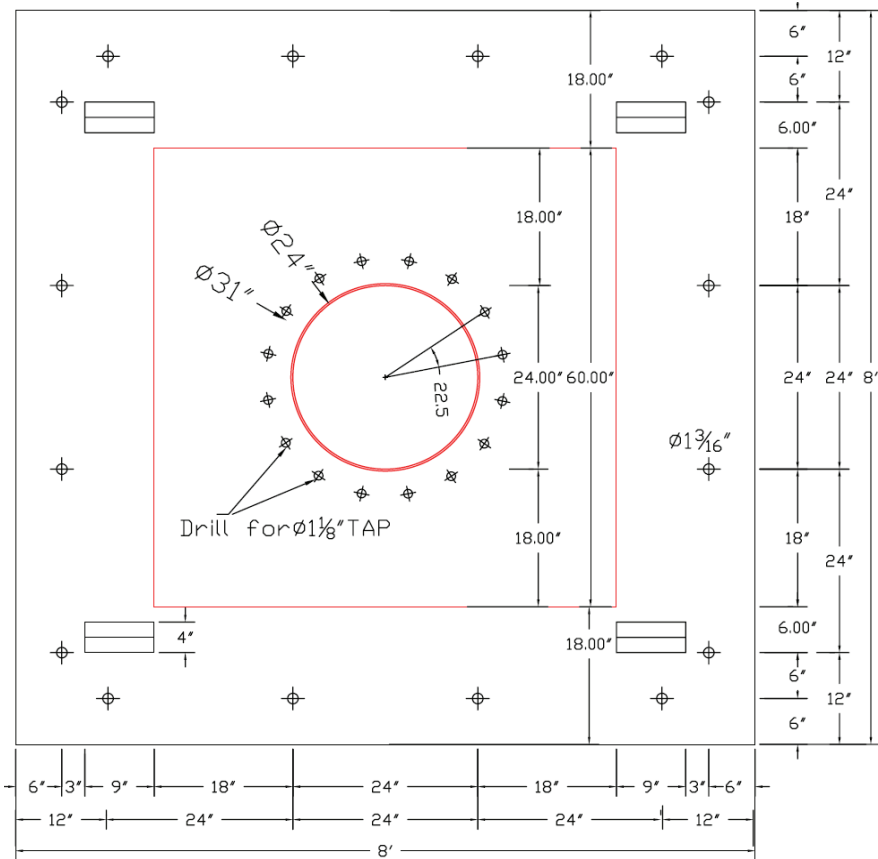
Plan View of the Reinforced Concrete Slab (Muhammad, 2012)
